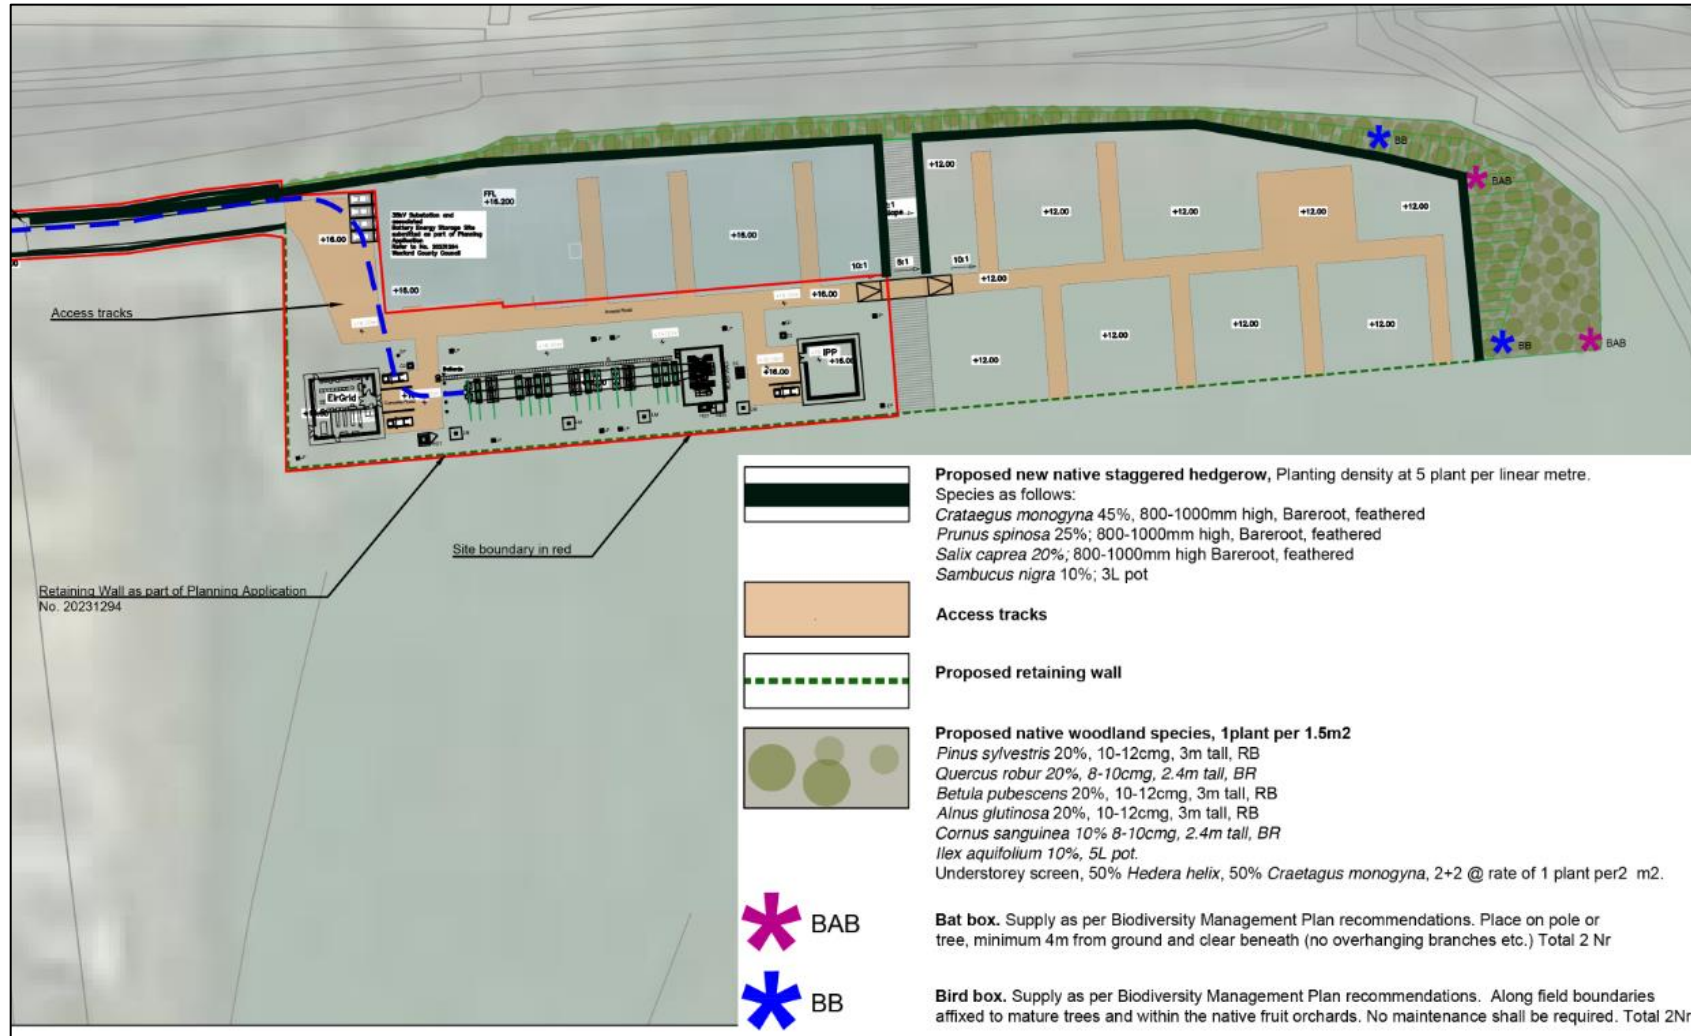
Proposed landscaping plan (detail) (after Cathal Meara Landscape Architects)
